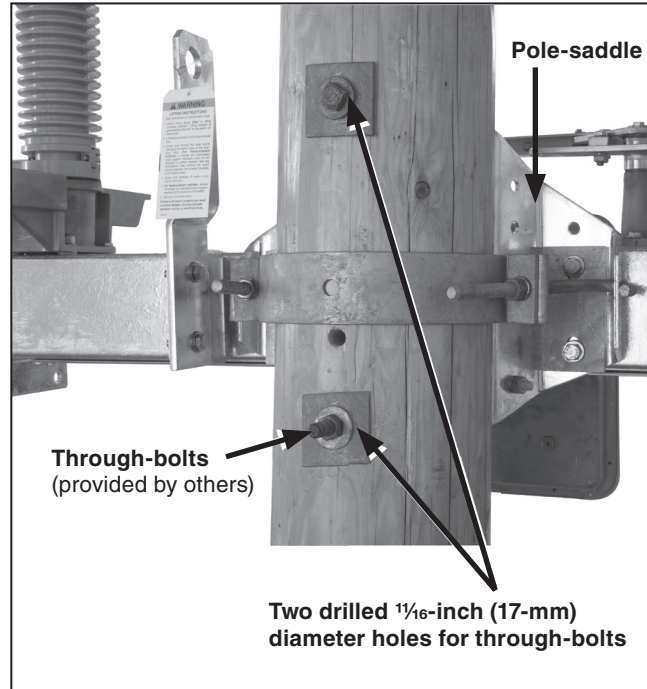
Drilling holes for mounting (upright mounting configuration shown).
